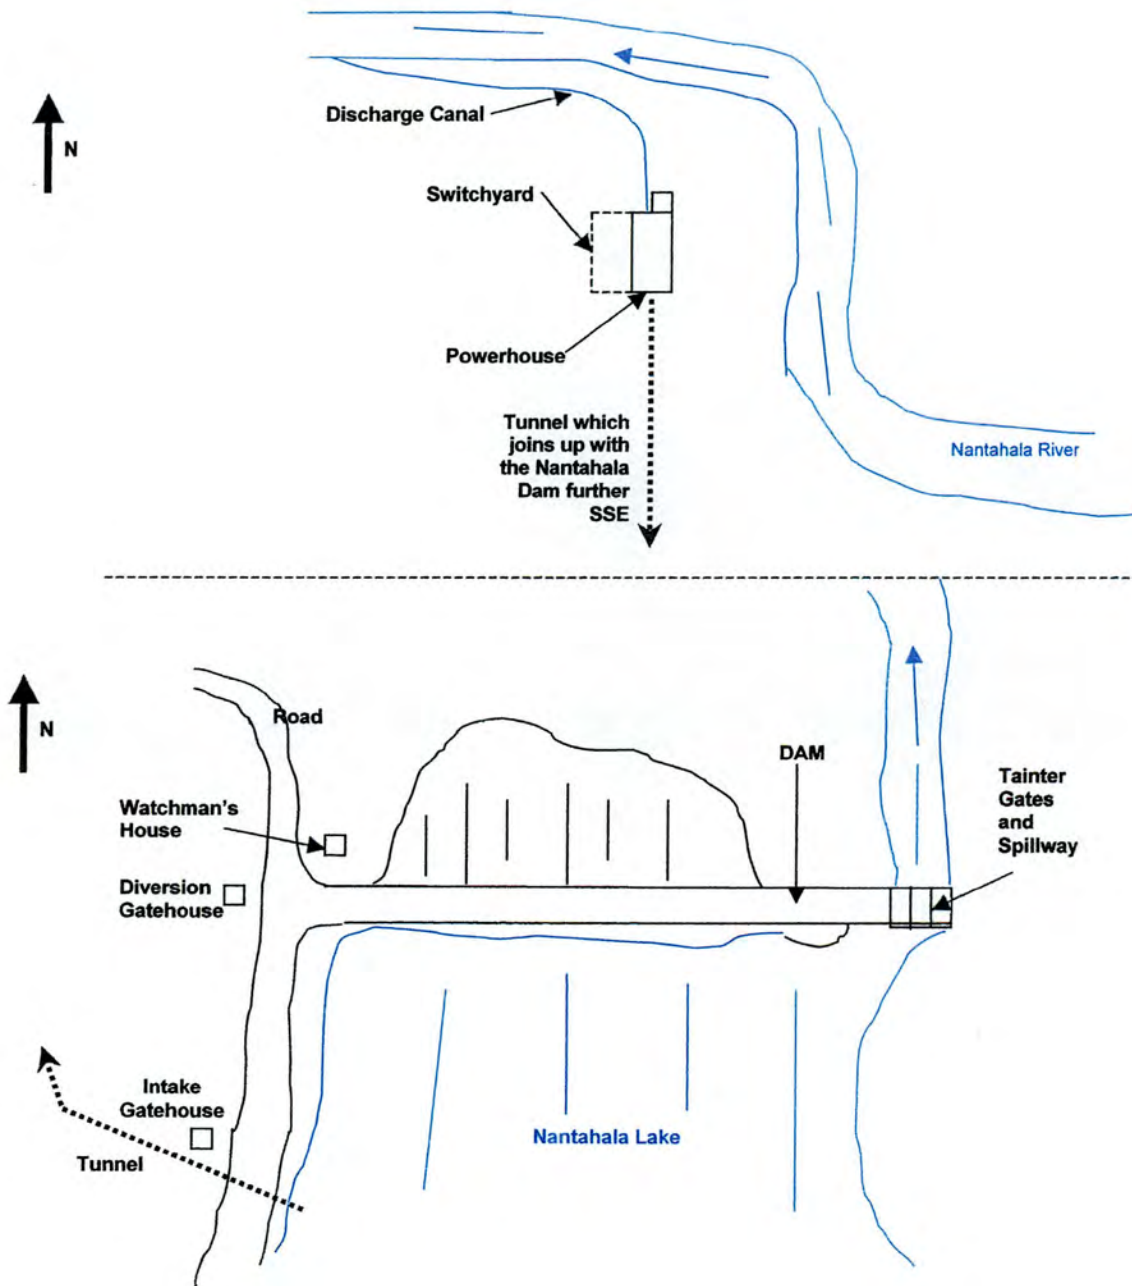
Nantahala Dam and Powerhouse Site Plan.
